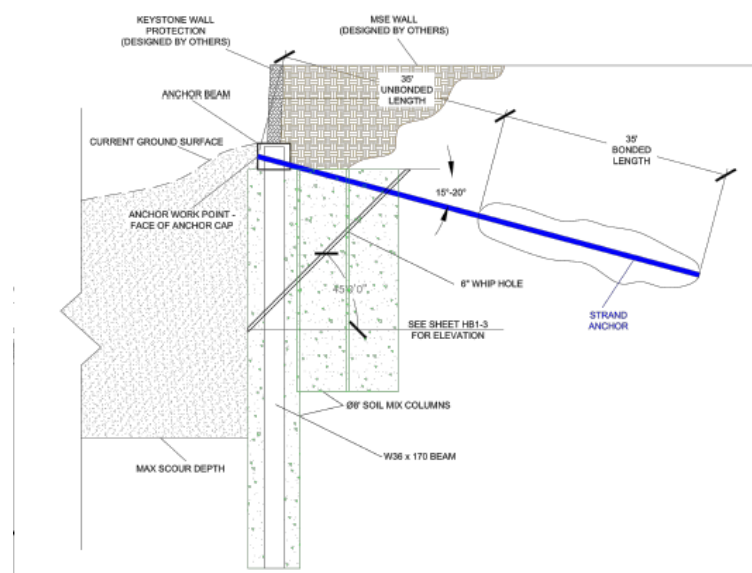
Typical section of recently constructed CDSM wall with ground anchor topped with MSE wall.
